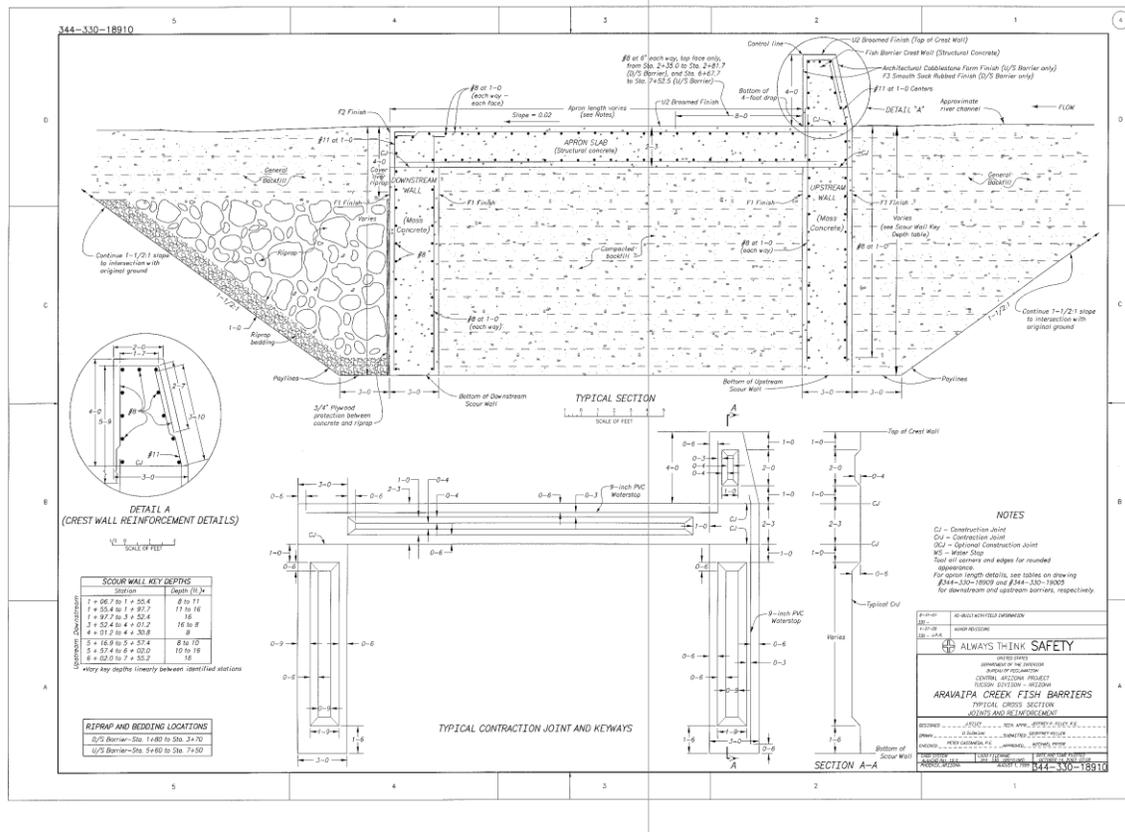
Typical cross-section joints and reinforcement for Aravaipa Creek barriers.
